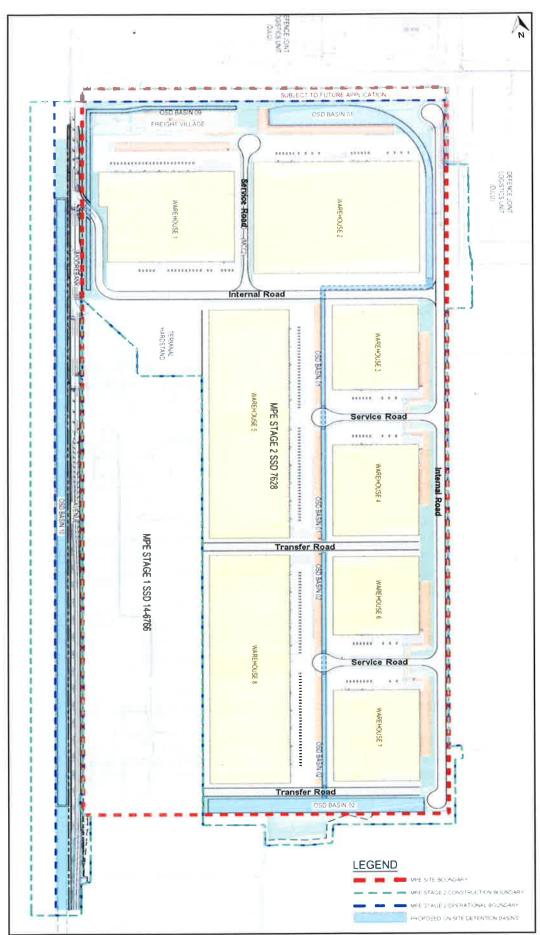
Proposed site layout and access (Base source: Applicant's RtS)
